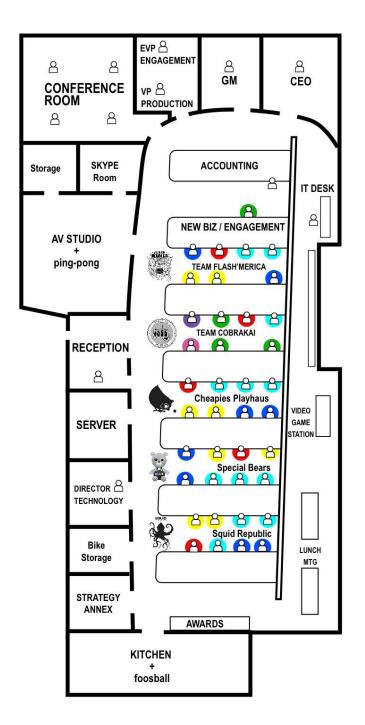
Big Spaceship: Floor Plan of Work Space, 2008
